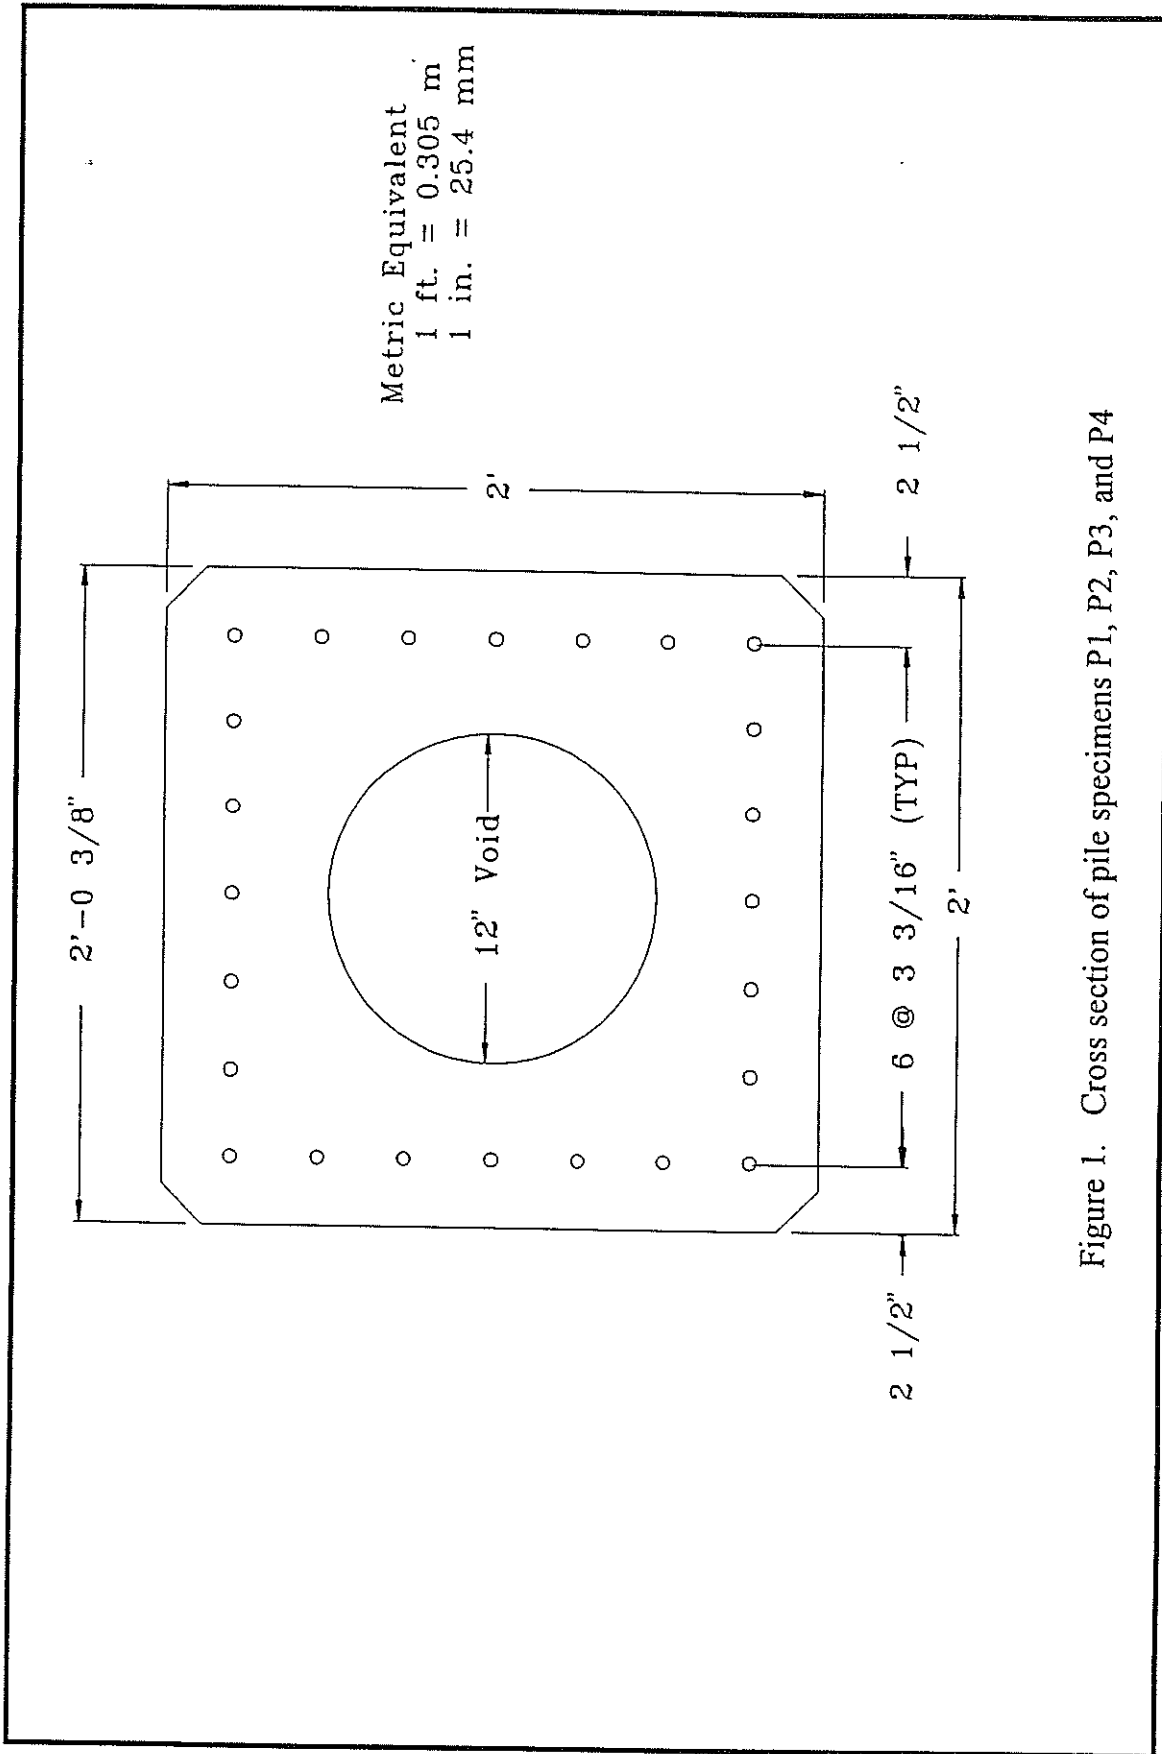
Cross section of pile specimens P1, P2, P3, and P4
